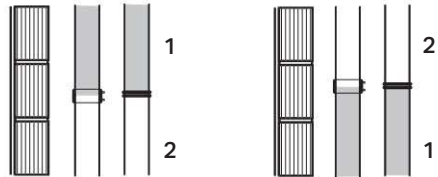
Transition with Geberit electrofusion sleeve coupling or butt welding
